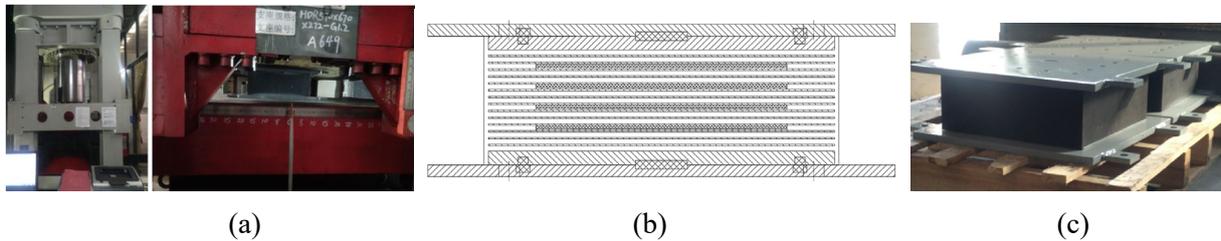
Experimental testing on CRBs: (a) testing machine; (b) profile of bearings; (c) full-scale specimens.
